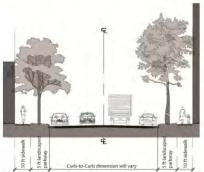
LANDSCAPE PARKWAY AND SIDEWALK REQUIREMENT
